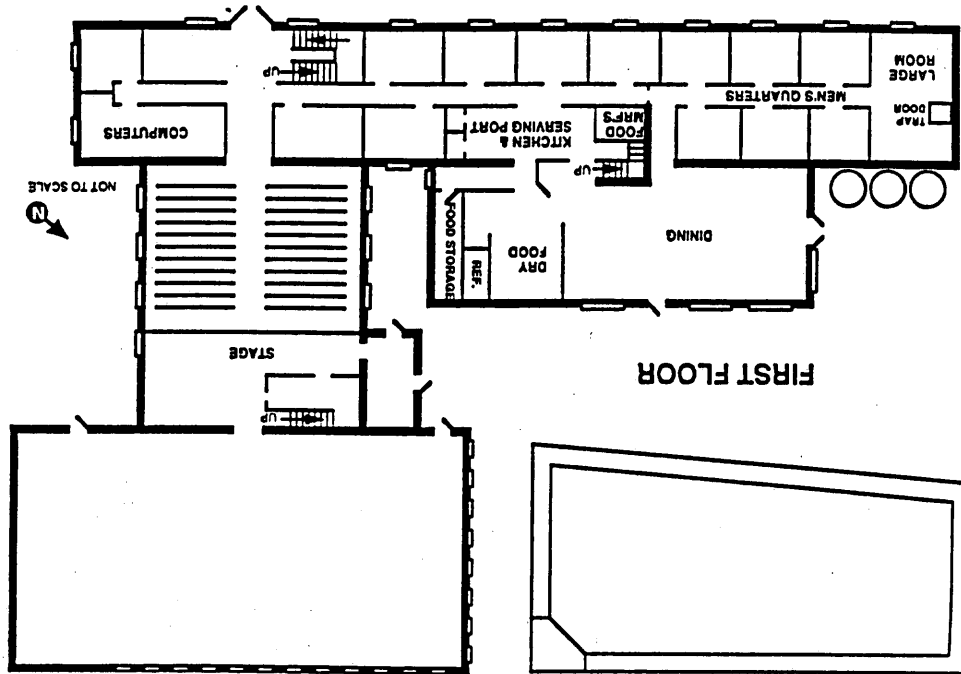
Floor plan of first level based on Block's memory of the Compound's living arrangements.
